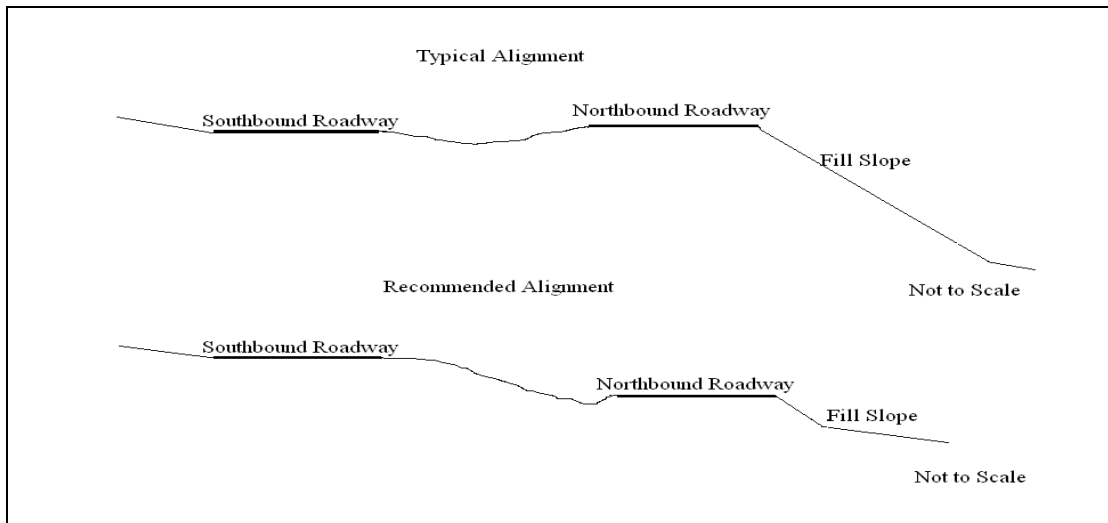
Split Alignment: Typical Alignment and Proposed Alignment
